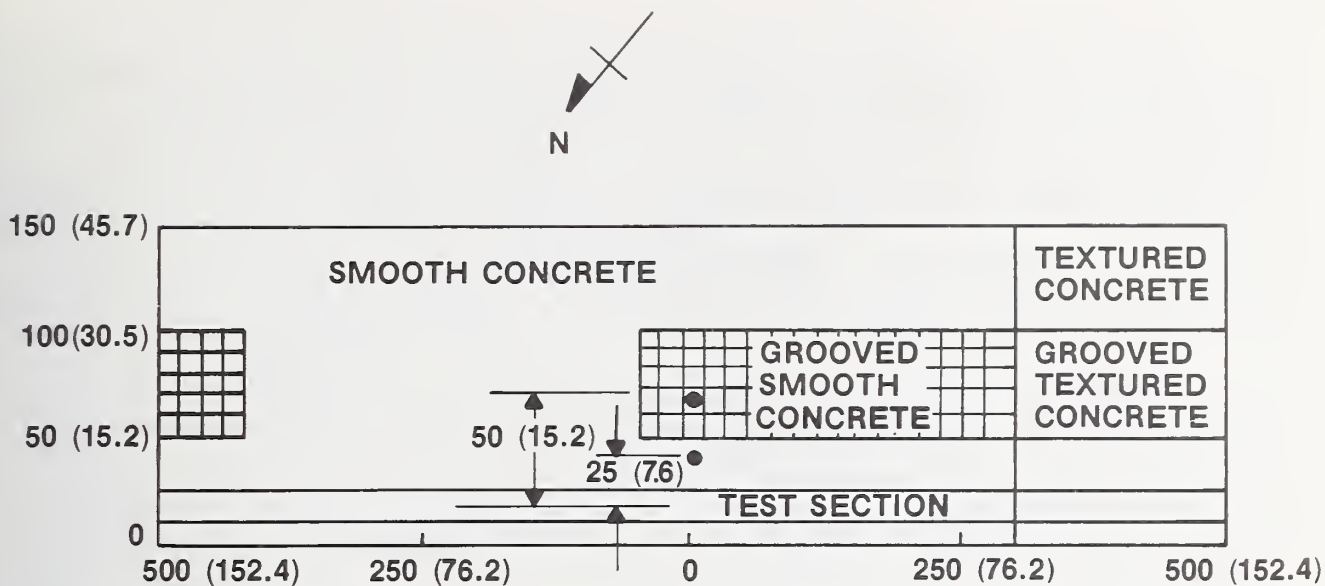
Plan of concrete test area on runway 4-22. Distances are in feet (metres). Solid circles designate the two microphone locations.
